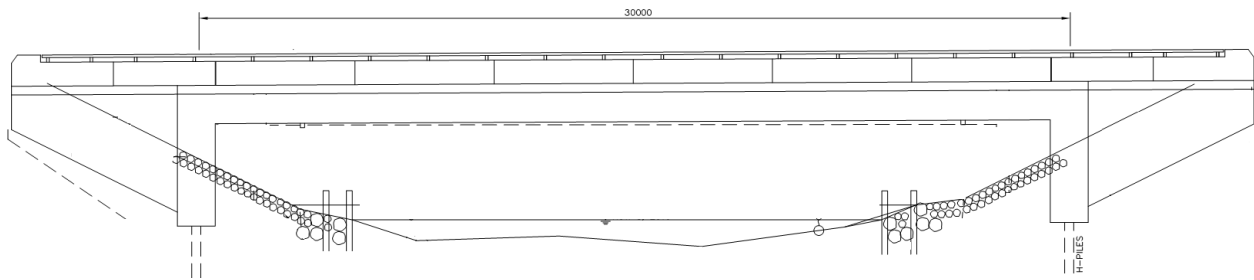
Elevation View of Huron County Road 83 Bridge over Ausable River
